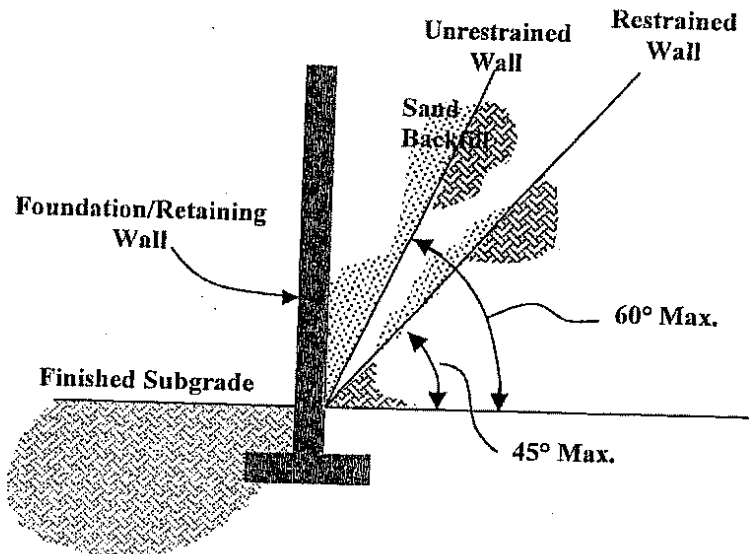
Required Area for Sand Placed Behind Basement-Type and Retaining Walls
